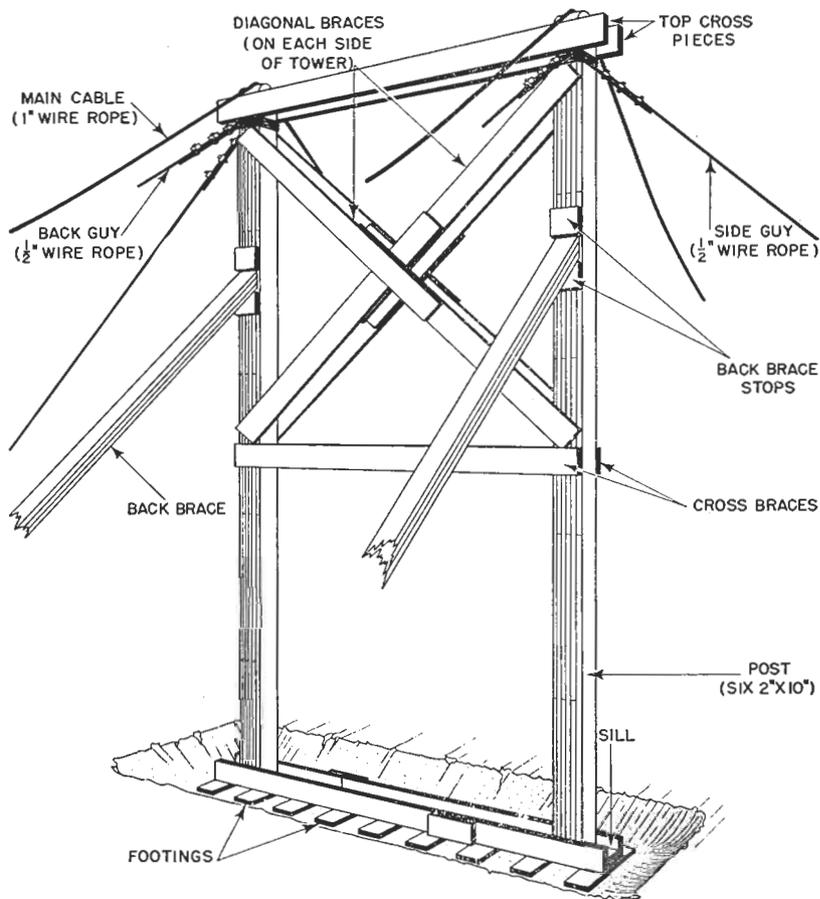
Prefabricated tower for light-equipment suspension bridge. Used for long spans when dimension lumber is available.
